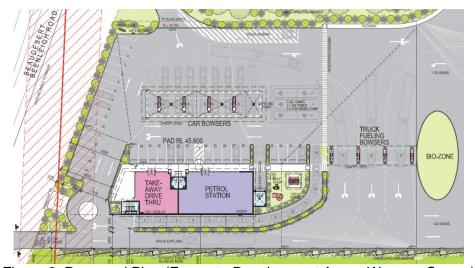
Proposed Plan (Excerpt - Development Area - Western Corner)
